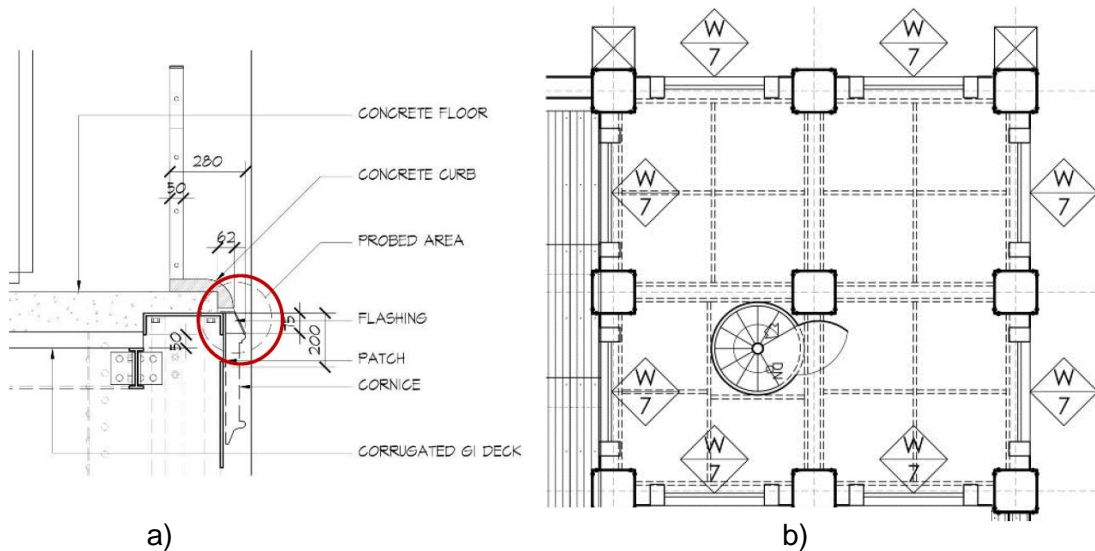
Details of the concrete slab of the towers: a) Cross-section of the floor; b) Plan of the towers.
